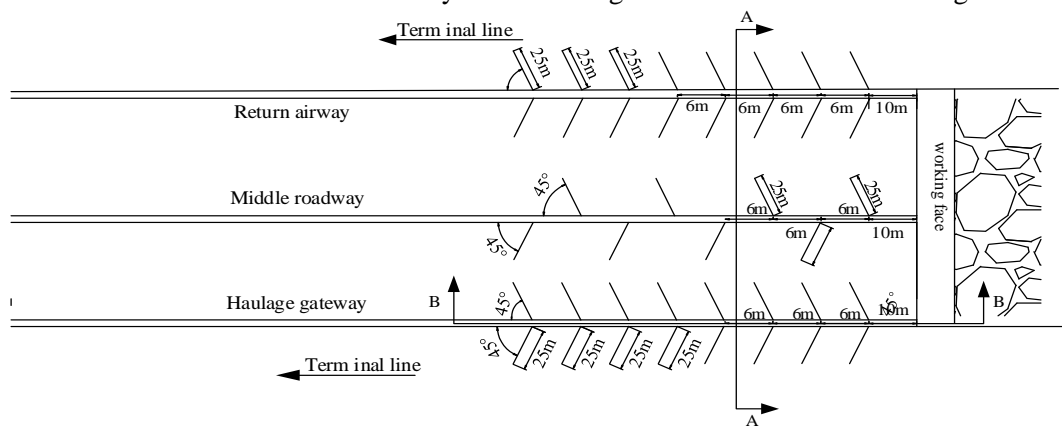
Long-hole blasting design on the roof in 163_{lower}02C working face
